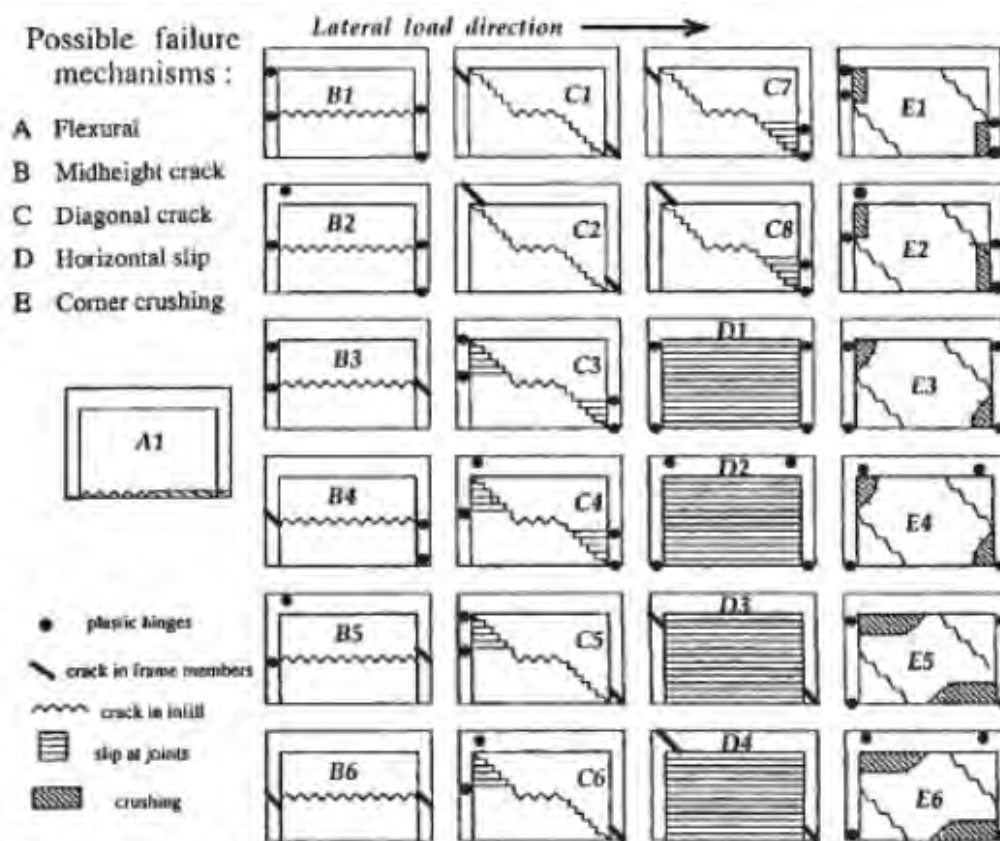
Collapse mechanism of solid infill masonry with reinforced concrete frame (Shing and Mehrabi, 2002)
